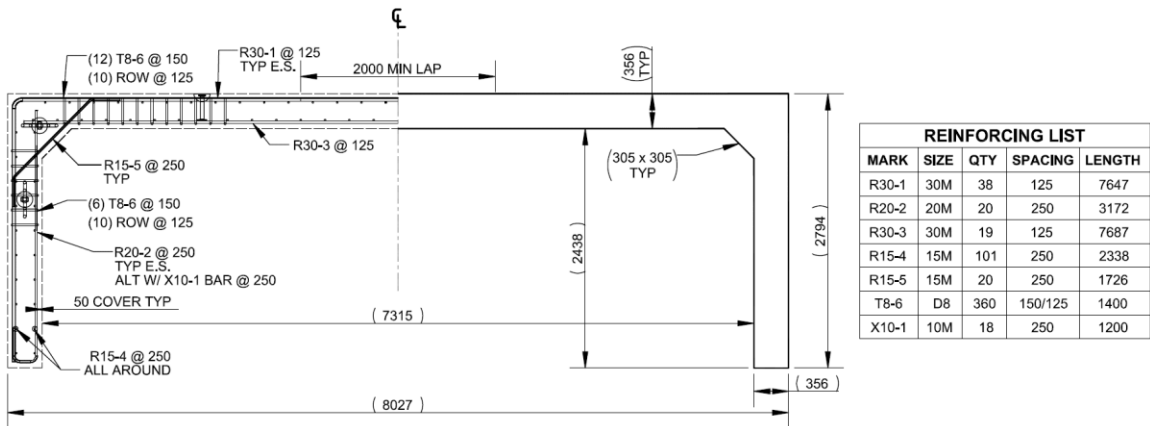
Geometry and reinforcement details of the Remembrance culvert. (All dimensions are in mm)
